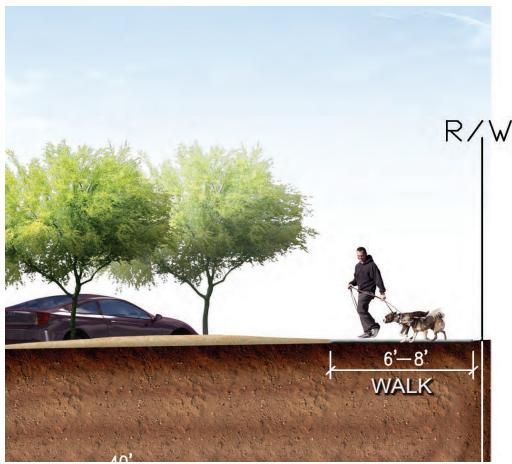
| Xeriscape Landscaping Section Parkways and landscaped strips feature canopy trees
